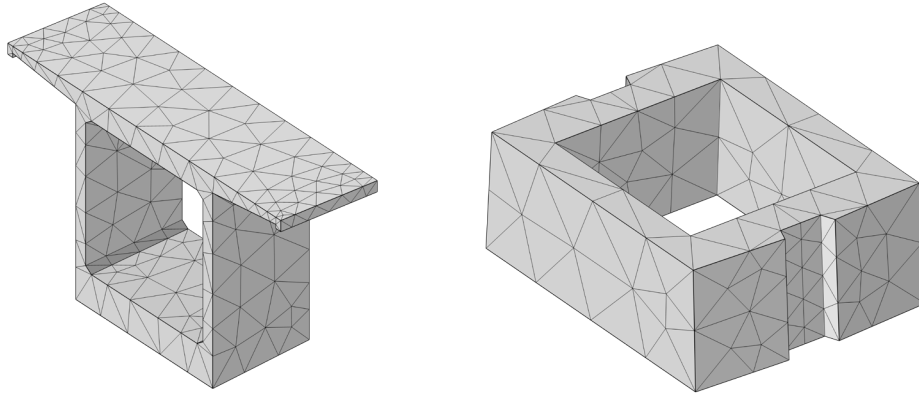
Typical deck section (left) and section of highest pier (right) with their FE mesh.
